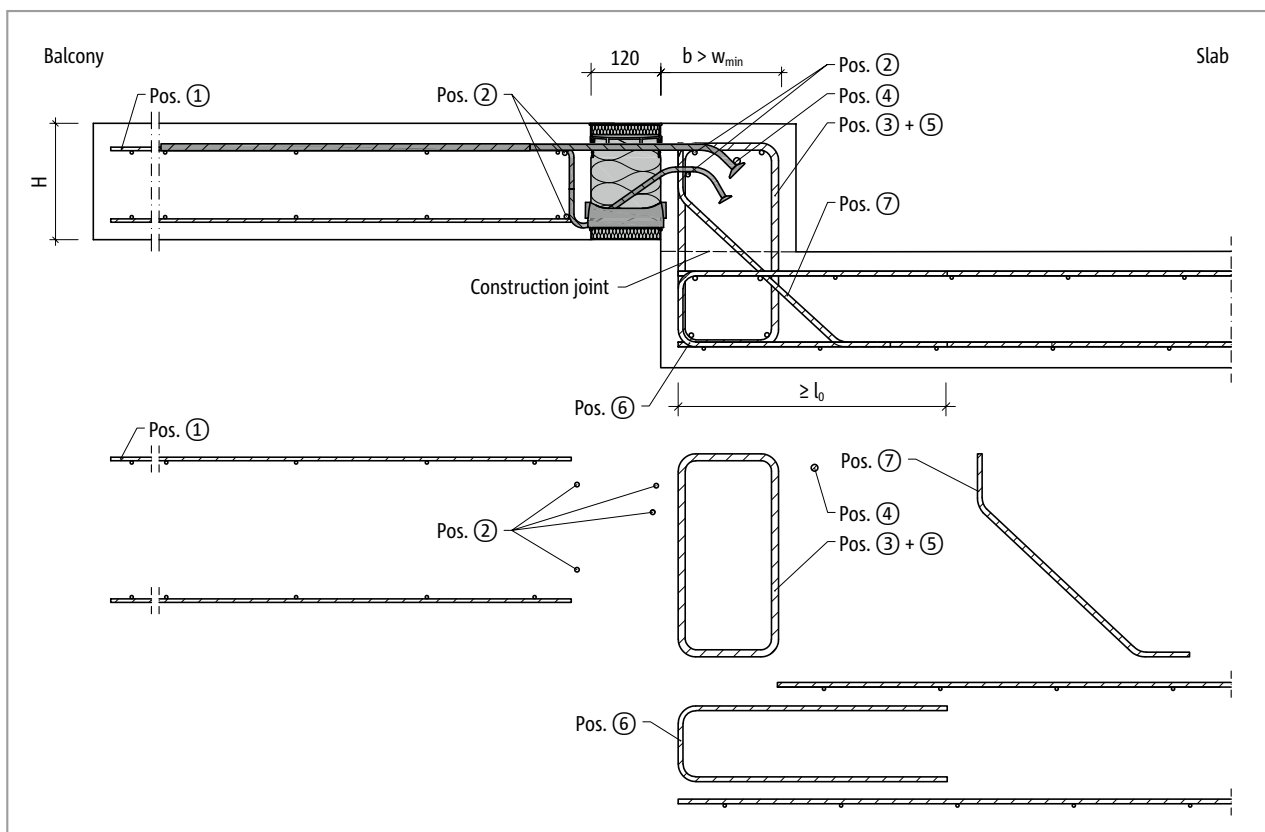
Schöck Isokorb® XT type K-O-F: On-site reinforcement for balcony with height offset upwards with larger structural component dimension ( $w_{exist} \geq w_{min}$ )
